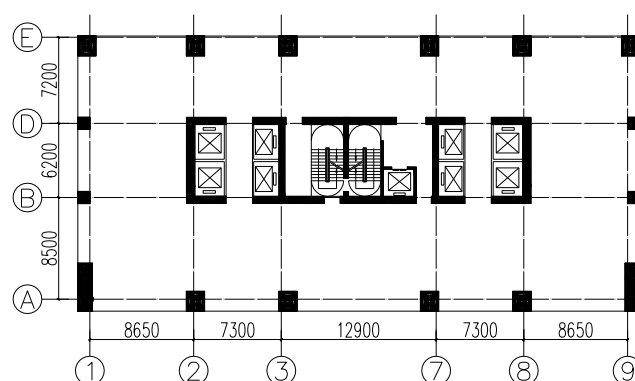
Standard floor plane of Shenzhen Hengyu Houhai Center B and C towers.
